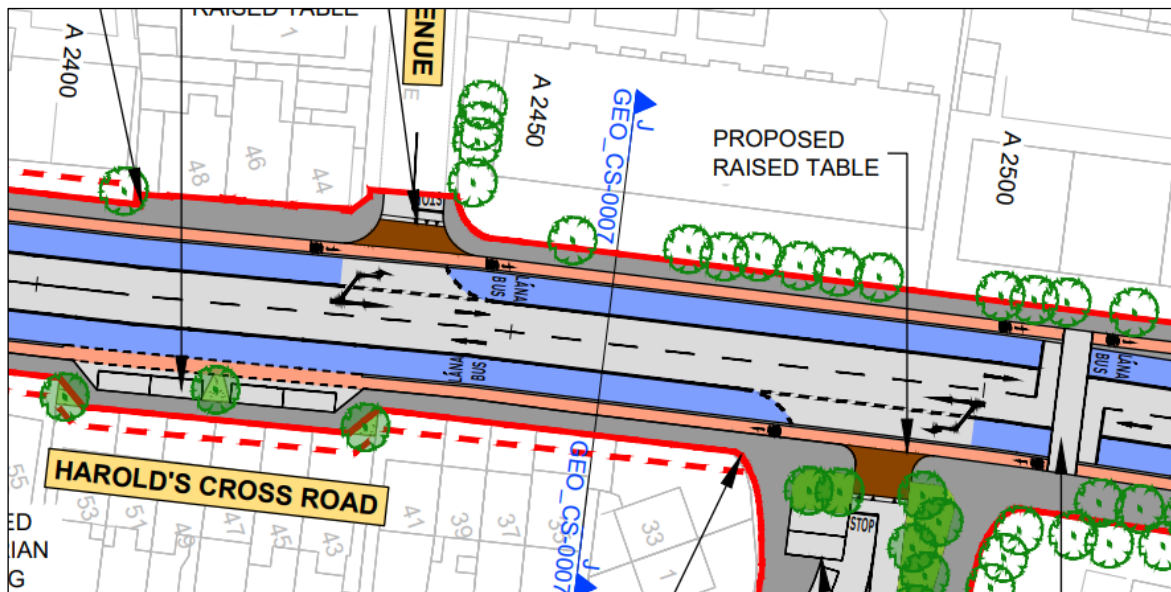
Extract from General Arrangement Map Sheet 7
